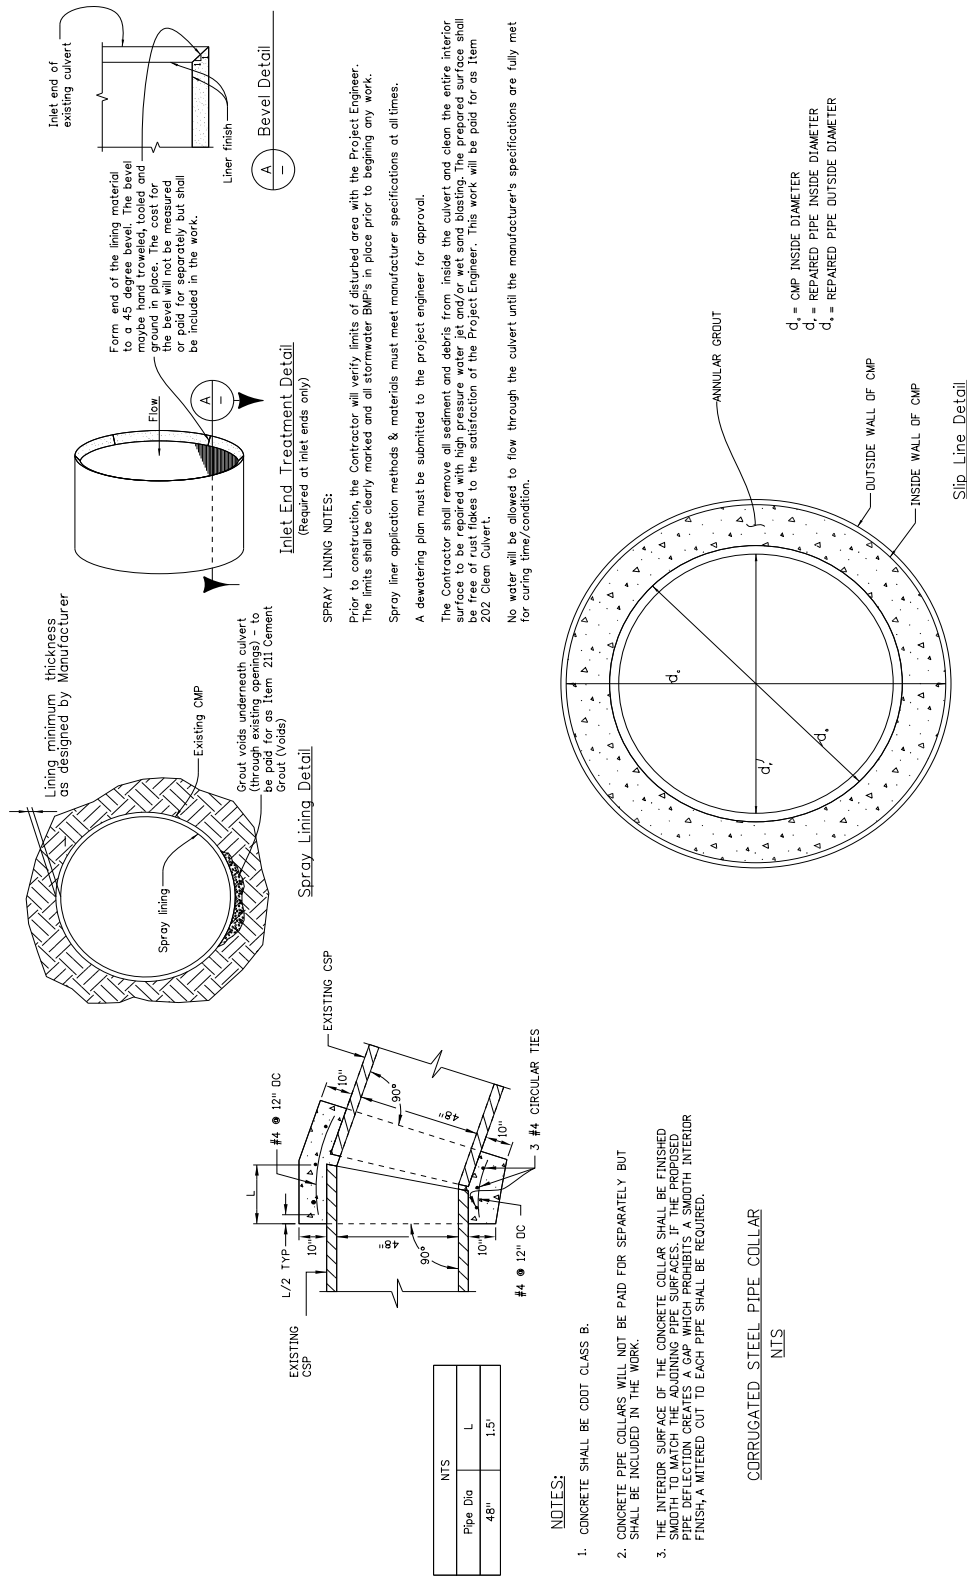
(L)-3 Sample Details for Repairing a circular culvert by slip-lining
